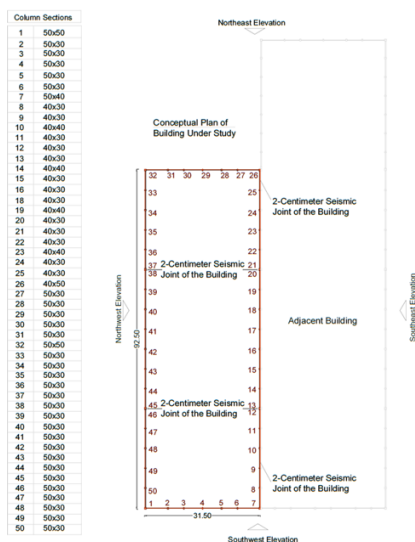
Plan of the building under study. The dimensions of the building are in meters and of the columns in centimeters
